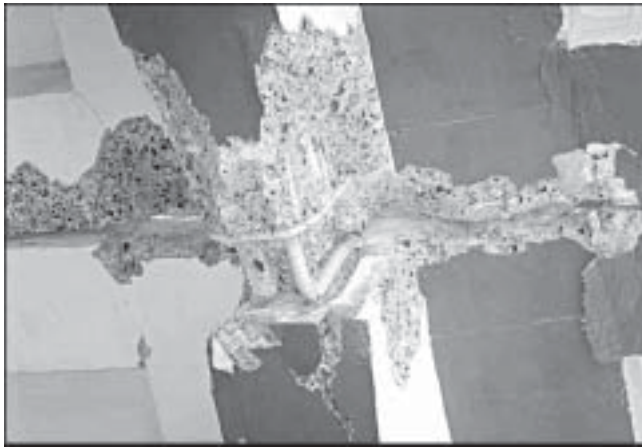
Surajbari Bridge, Gujrat after 2001 earthquake. (Note: no bond of concrete with epoxy coated reinforcement)
